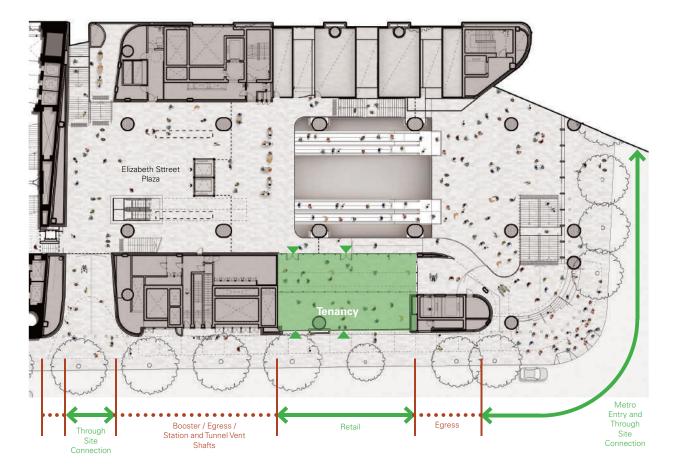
Ground Floor Plan, Elizabeth Street maximises active street frontages
